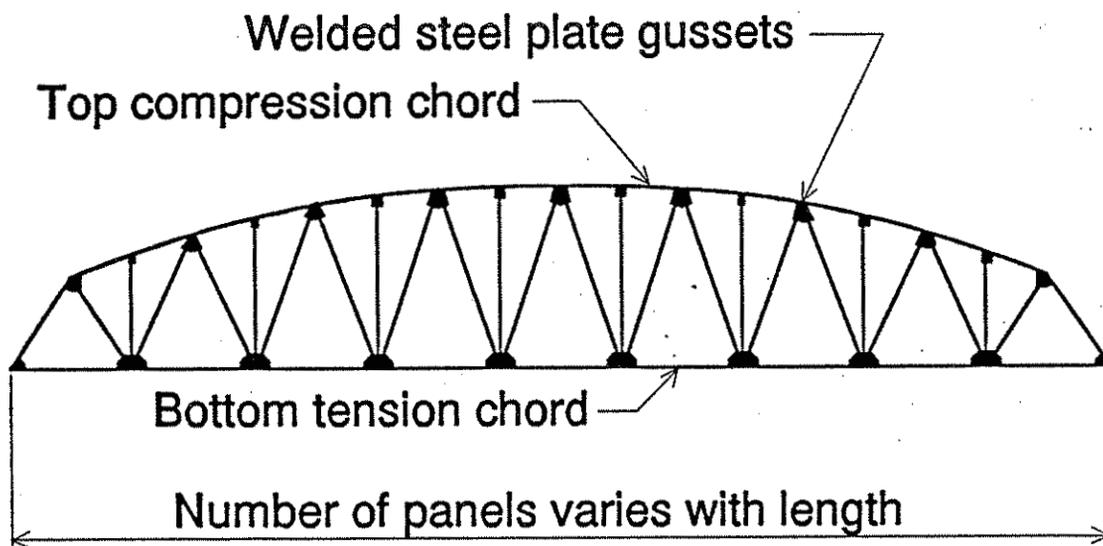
U.S. bridge welded steel truss bridge.
